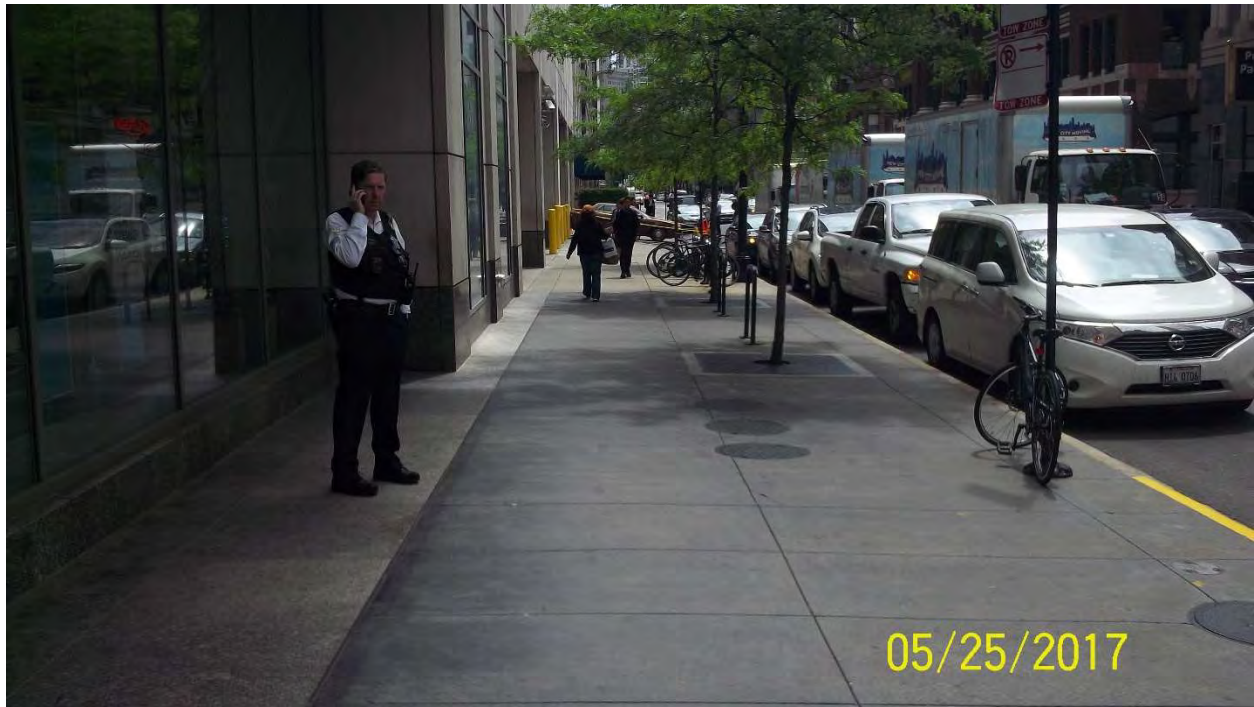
Southeast corner of Chicago Ave. / Rush St. – Looking South
